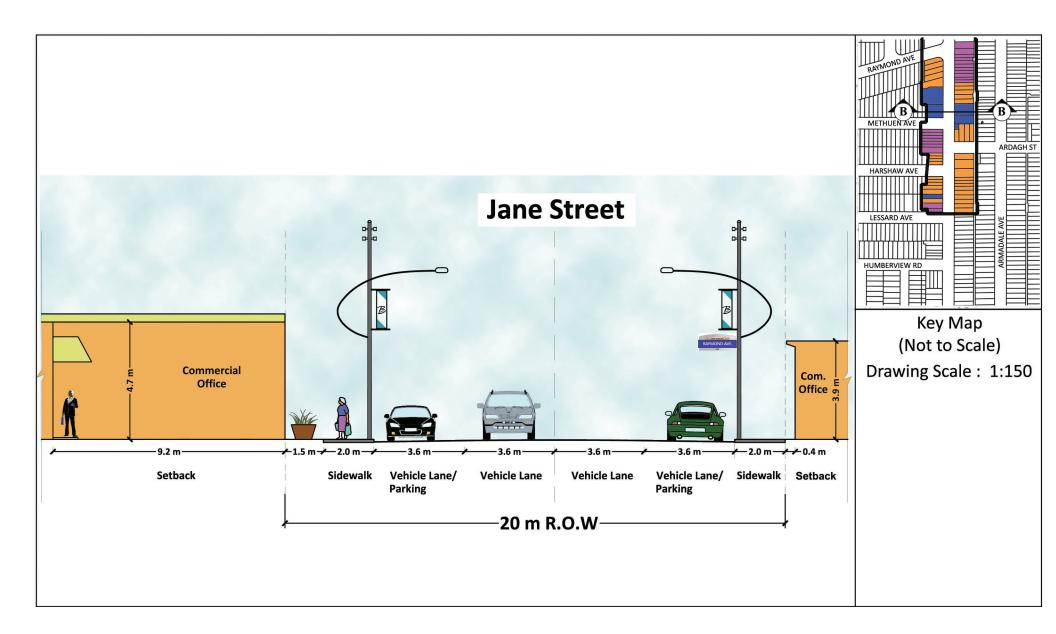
Jane Street Cross-Section B (Pre-LRT, Commerical on Both Sides)
